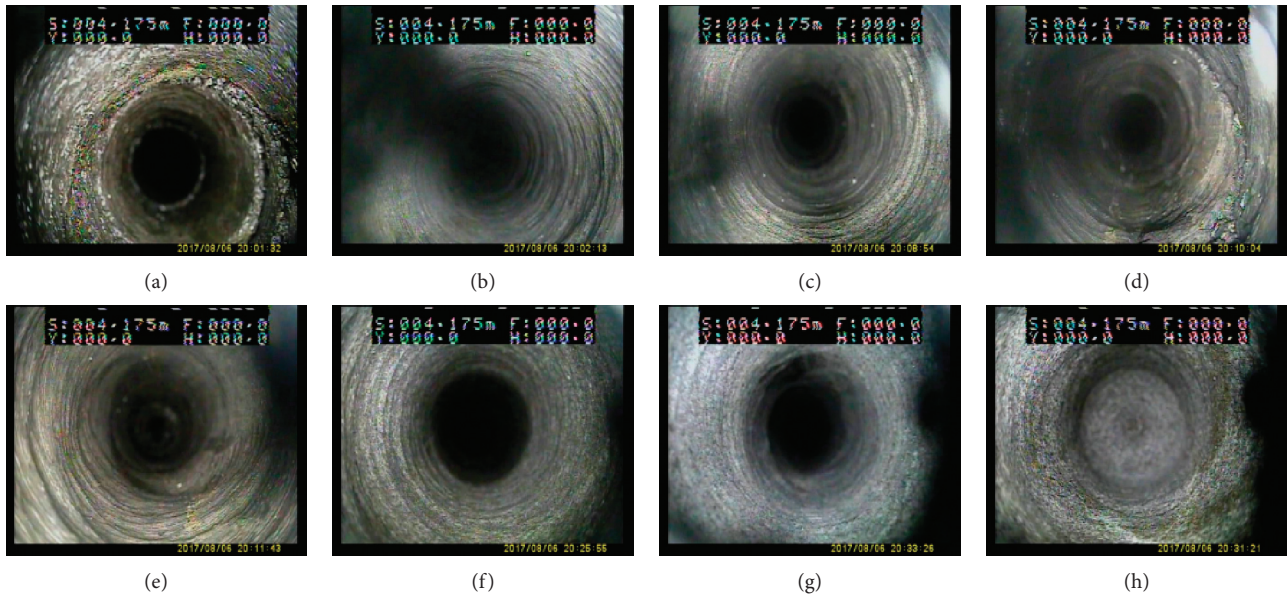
The distribution of the surrounding rock (2.8–10 m) outside the anchor zone. (a) 2.9 m. (b) 3.4 m. (c) 4.0 m. (d) 5.7 m. (e) 6.4 m. (f) 7.5 m. (g) 8.8 m. (h) 10.0 m.
